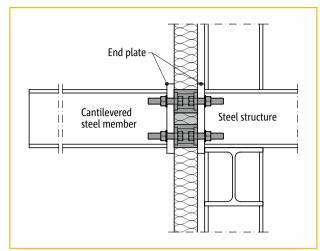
Combination of 2 Schöck Isokorb® type S22 for unsupported cantilevered steel structures
